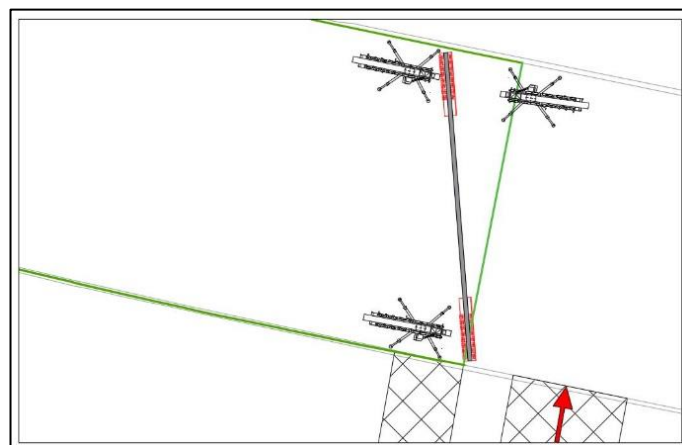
Layout of the cranes in hoisting the 280 tons beam
